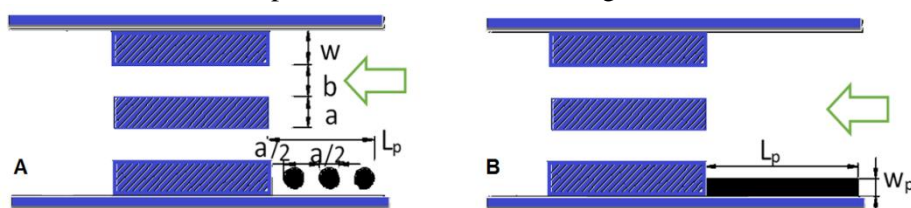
Model details [A] the extra piles case [B] the extra abutment case
